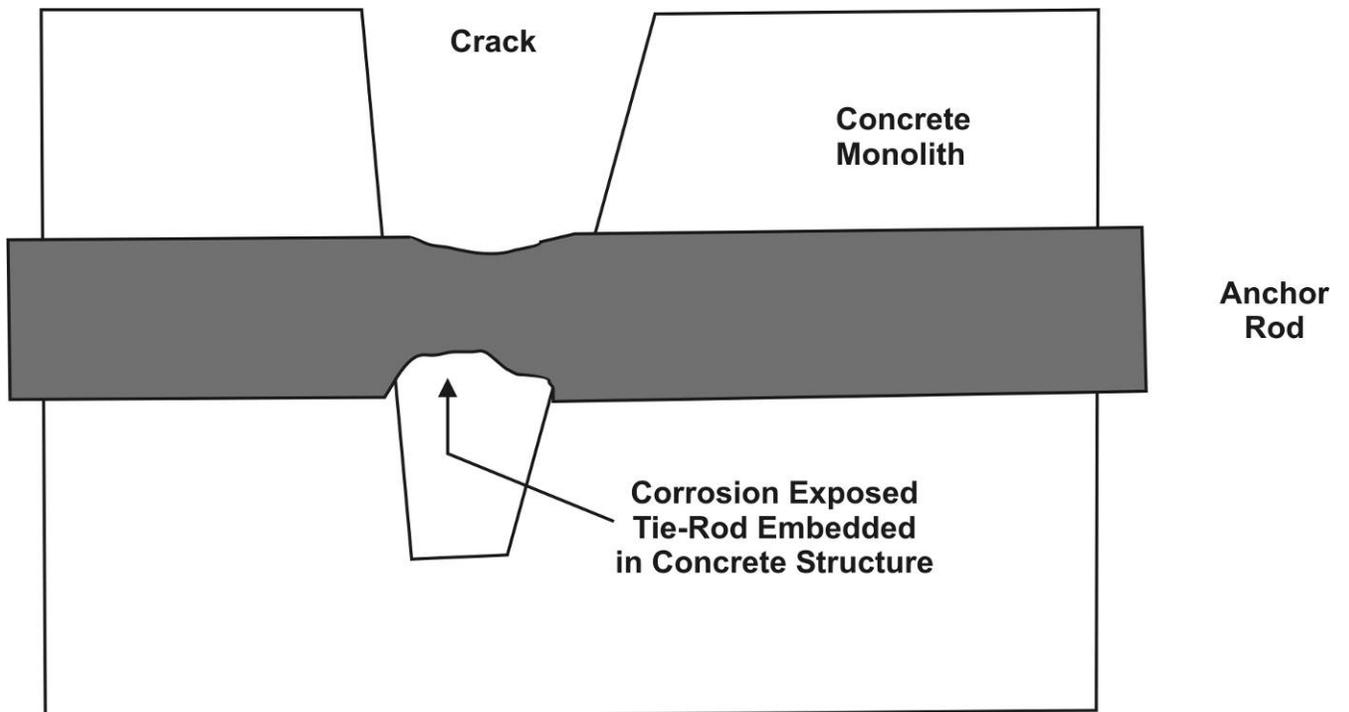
Deteriorated embedded tie-rod exposed by crack in concrete structure.
